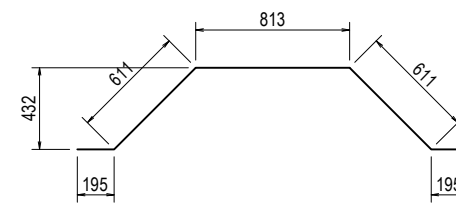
# DETAIL OF LIGHTING FOUNDATION (AF1-PF2)
